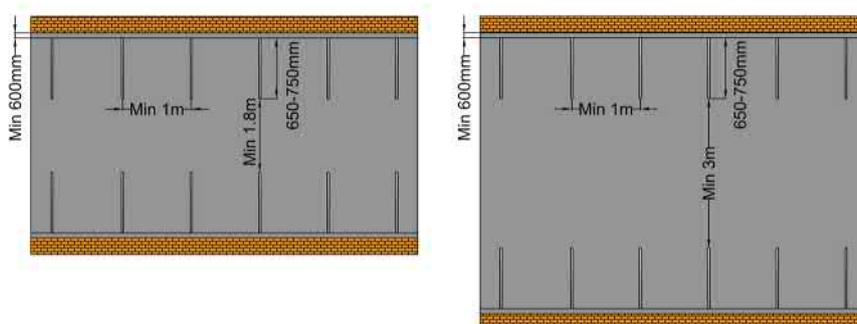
Cycle Parking Layout (Sheffield Style Stands) Plan View
